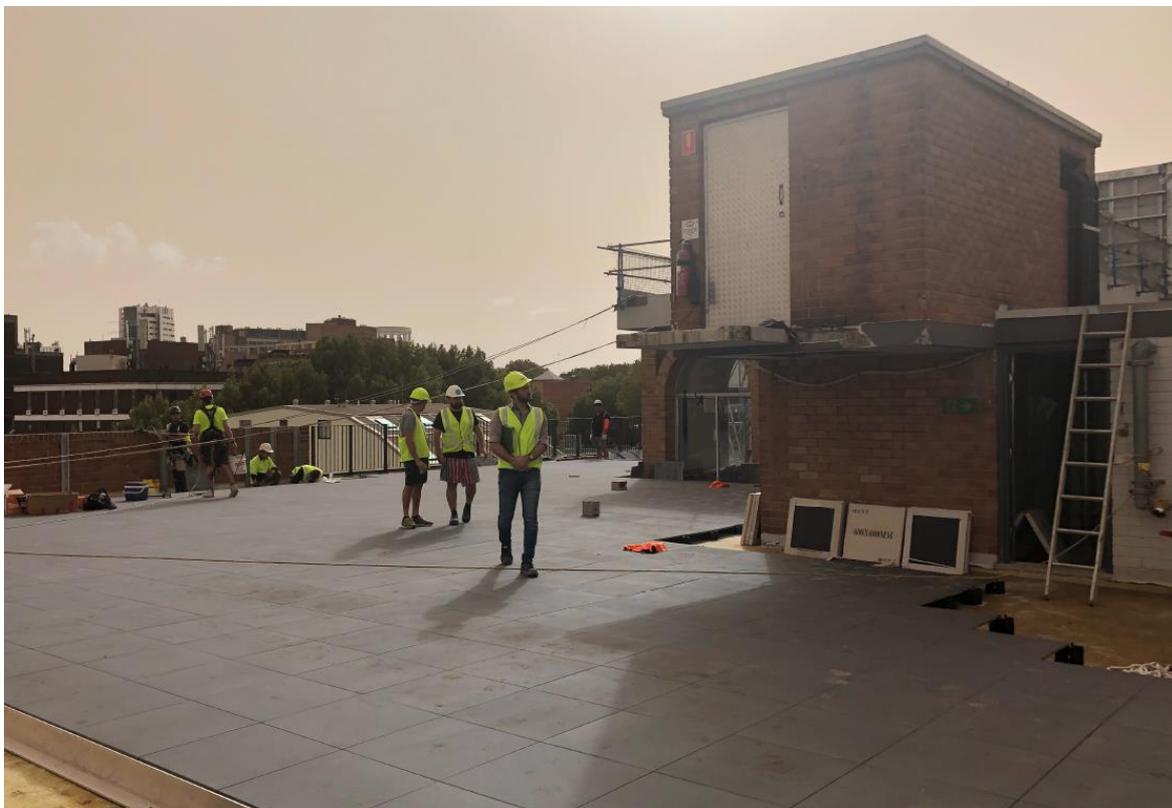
The roof terrace (works pictured were undertaken under a complying development certificate)
